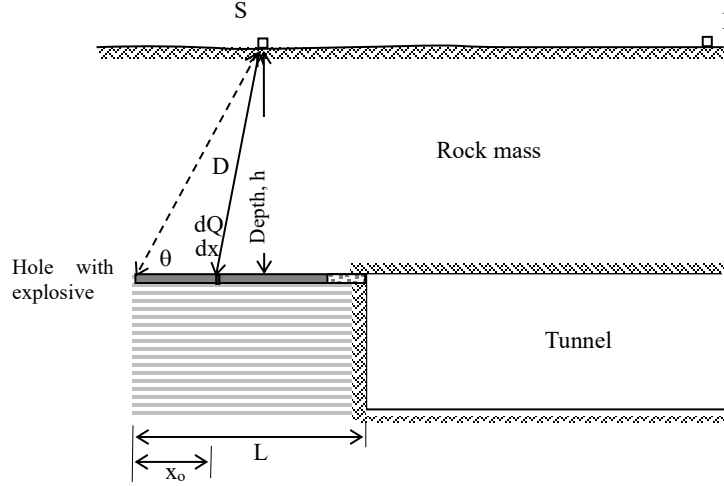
Explosive charge in a hole and vibration points on the outer surface
